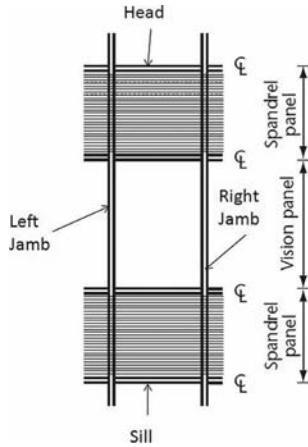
Typical annotation of curtain wall design found in 2D drawing (CSA, 2004).
